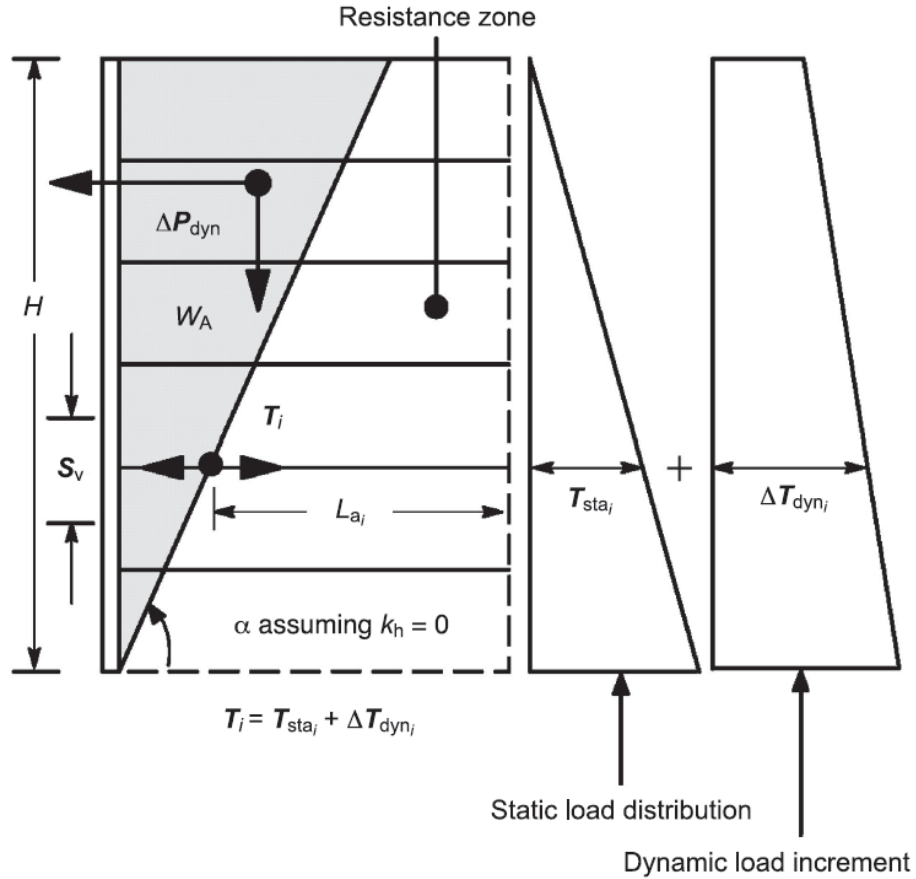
Calculation of tensile load,  $T_i$ , in a reinforcement layer for reinforced soil walls with extensible reinforcement (FHWA 1996)
